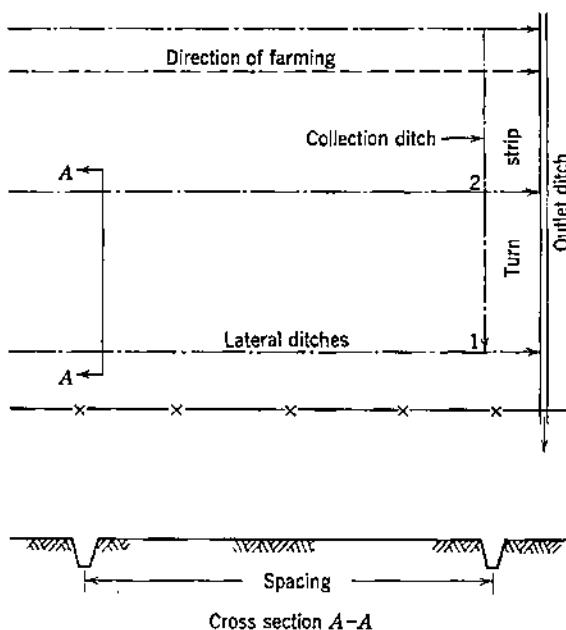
Parallel lateral open ditch system for water table control and surface drainage. (Adapted from Beauchamp.³)
